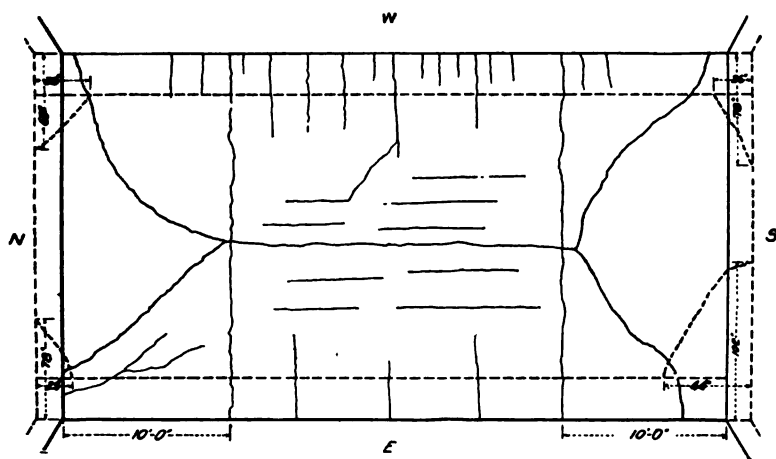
Diagram showing Cracks in Floor Slab.
